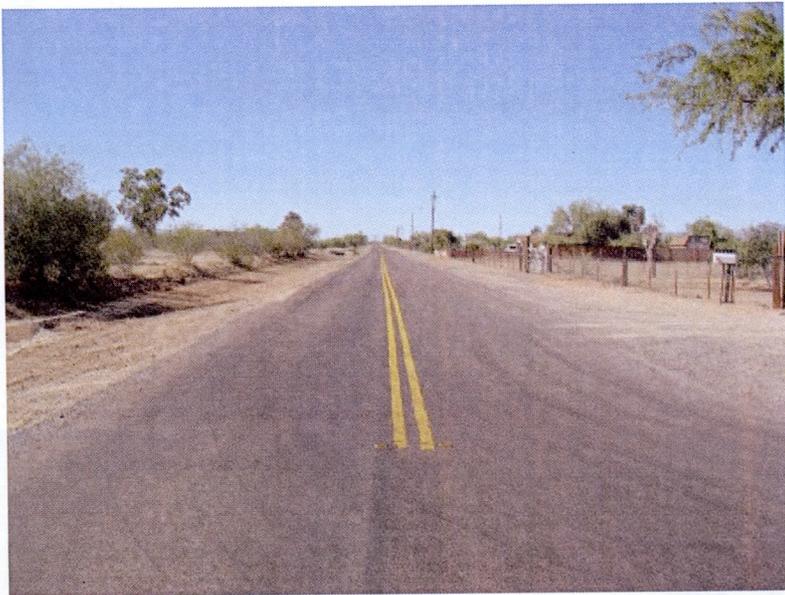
At intersection of Citrus Road and Enoch Drive looking south at Citrus Road.
